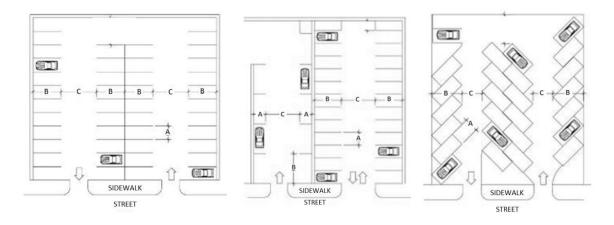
Parking Space and Drive Aisle Dimensions
